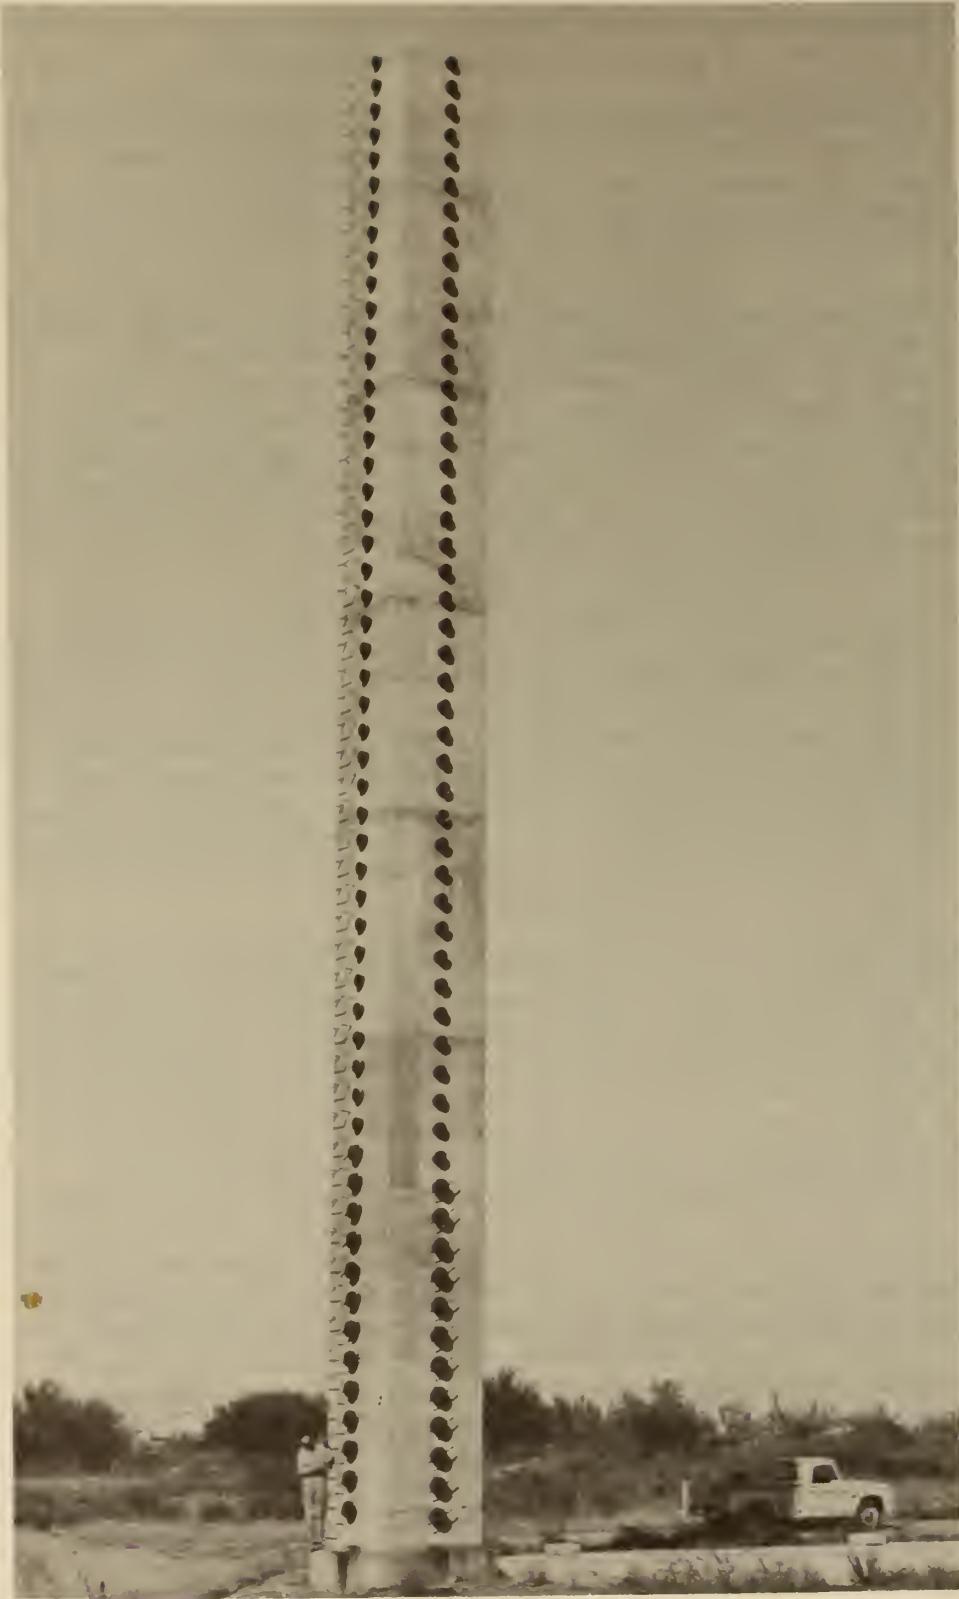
Decant tower with 6-inch outlets at 4-1/2 inches center-to-center.
